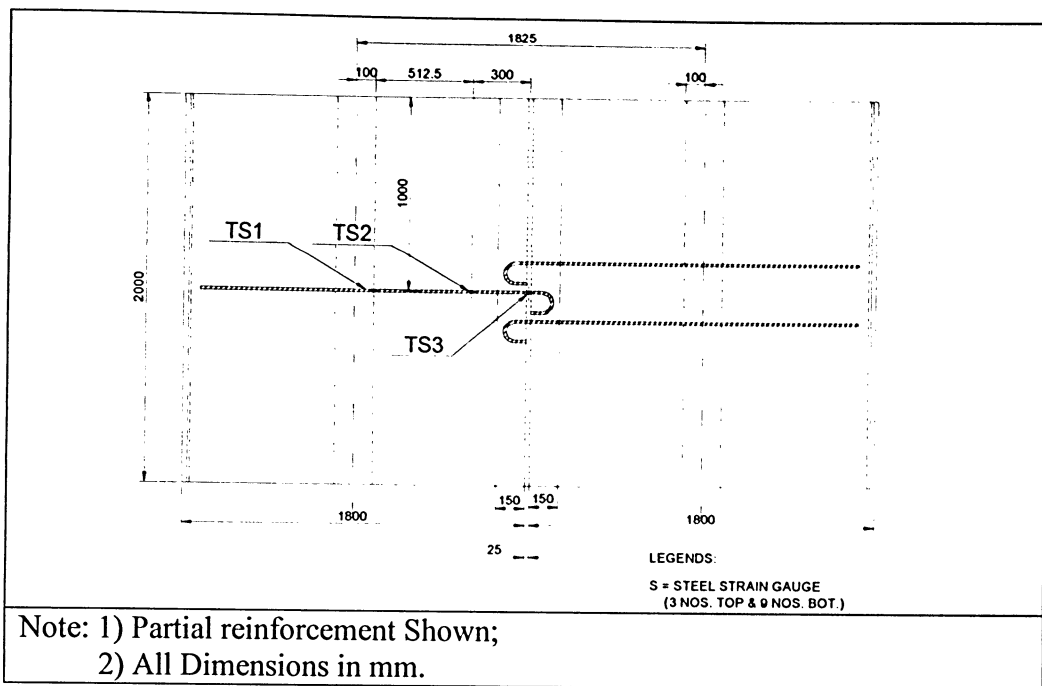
Plan of Top Steel Strain Gauges Location For Model M1
